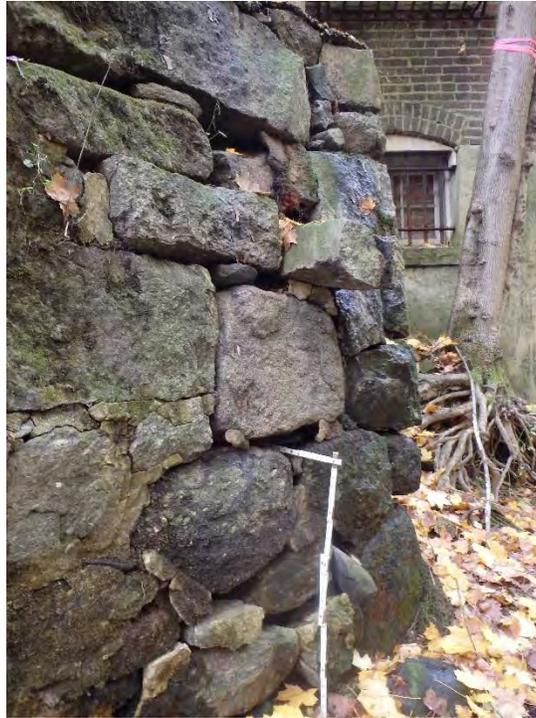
Collapsed West End of Section 8, Looking Northwest.
